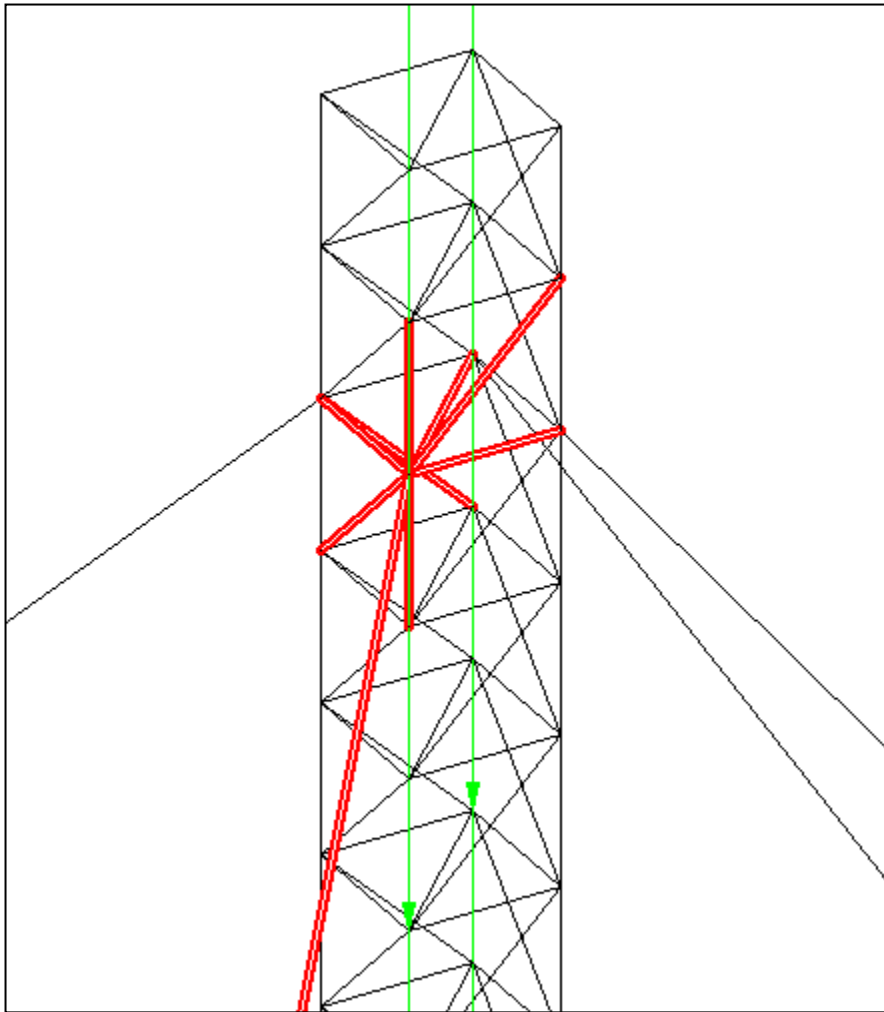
Beam stresses at intersection of guy cables and tower 1m from top
